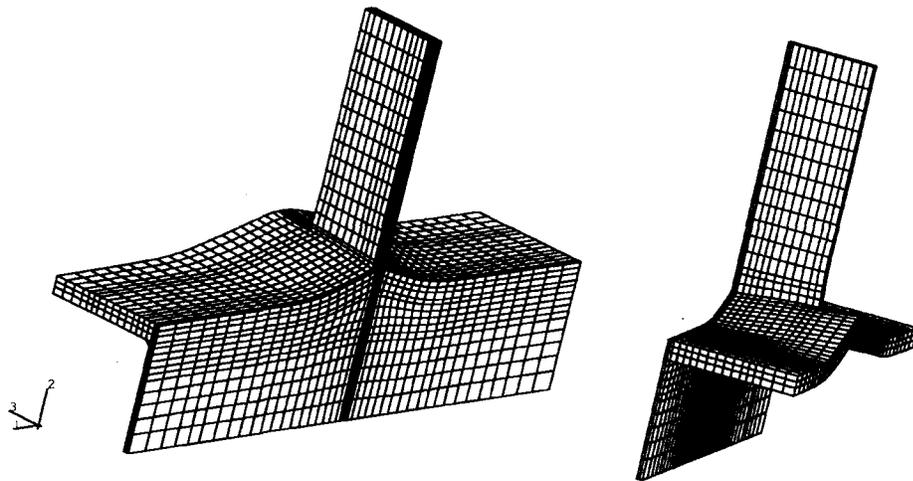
Deformed shape of pull-plate specimen showing local flange bending and local web yielding in a W14x132 (A992) column
